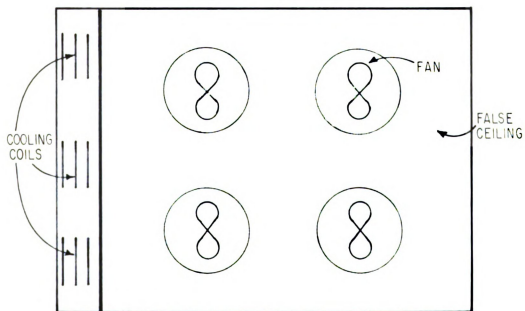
B-2. Schematic drawing of "packed-bed" room -- top view
